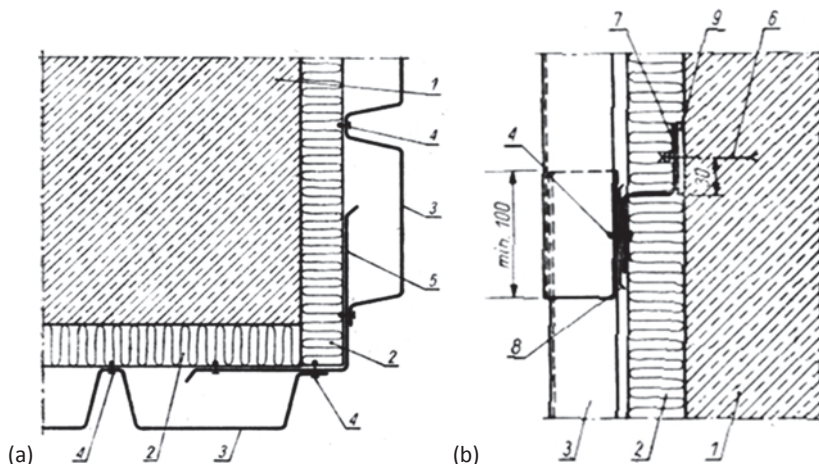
Layout of ETIDS components. (a) Corner top view. (b) Transversal section 1) base-wall 2) insulation board 3) coating (folded steel sheets) 4)fastener 5) corner strip 6)expansion bolt 7) Z profile 8)PVC washer 9) millboard washer (Plewako, 2007).
